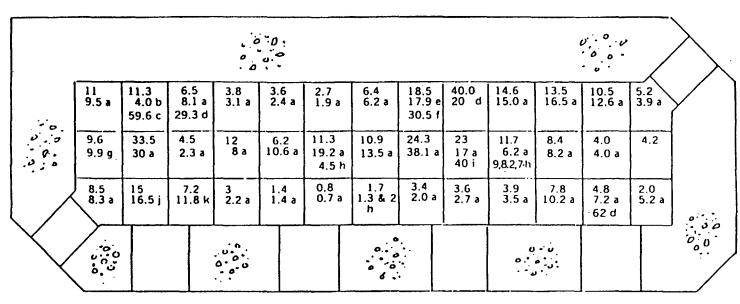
Floor Plan of the Process Building at a Plant Elevation of 30.48 meters (100 ft)
